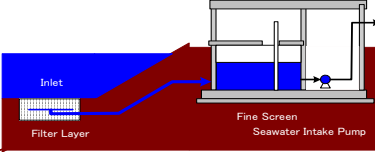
Schematic Plan of Seawater Intake Facility
